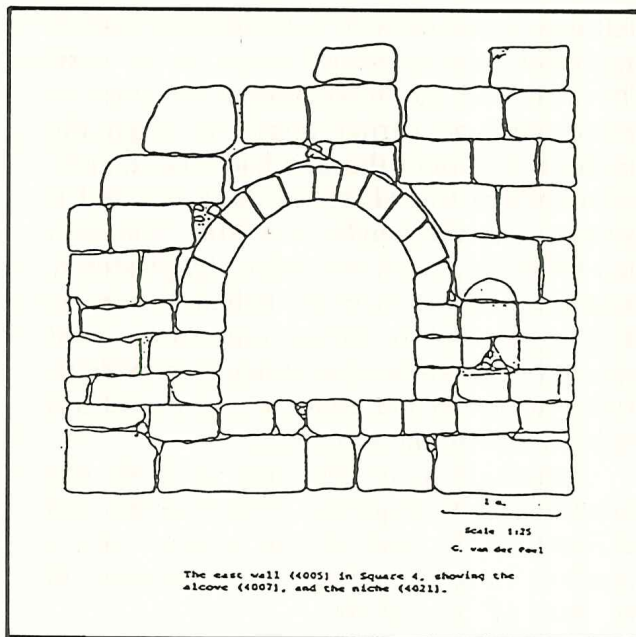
East wall and arch in Area B 4 in room with the checkerboard floor.
